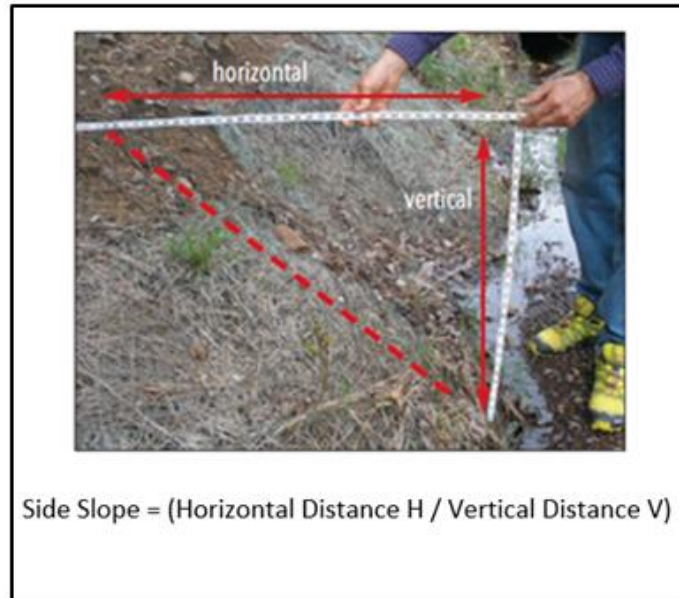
Determining ditch side slope (Brady et al. 2014)
